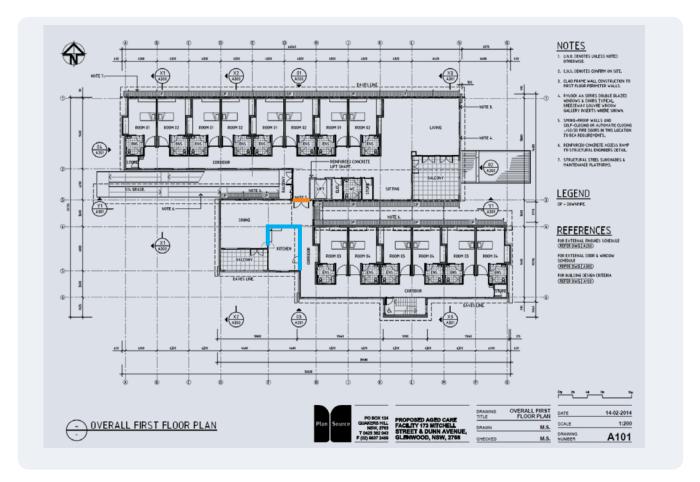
Floor plan of Residential Care facility showing Smoke-proof wall locations
